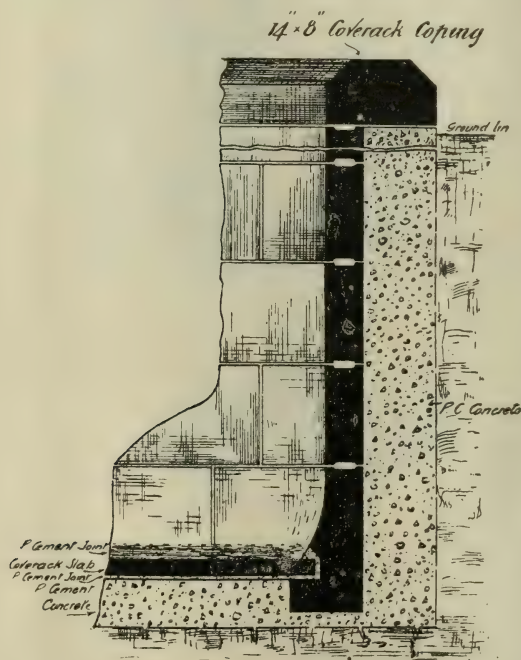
Vertical Section of Wall showing General Method of Construction of Concrete Reservoir: Dean Stone Company.
